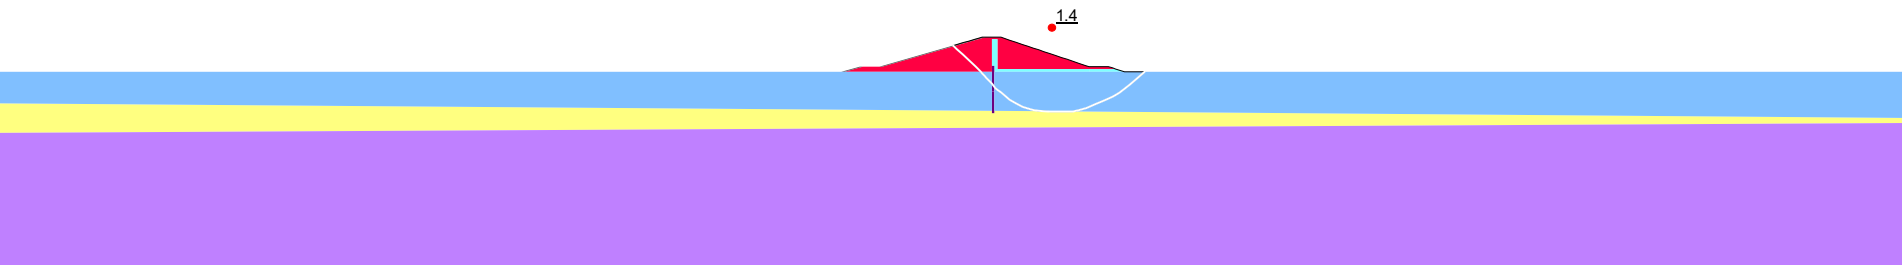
Alternative 3 End of Construction Downstream Factor of Safety— Birch
